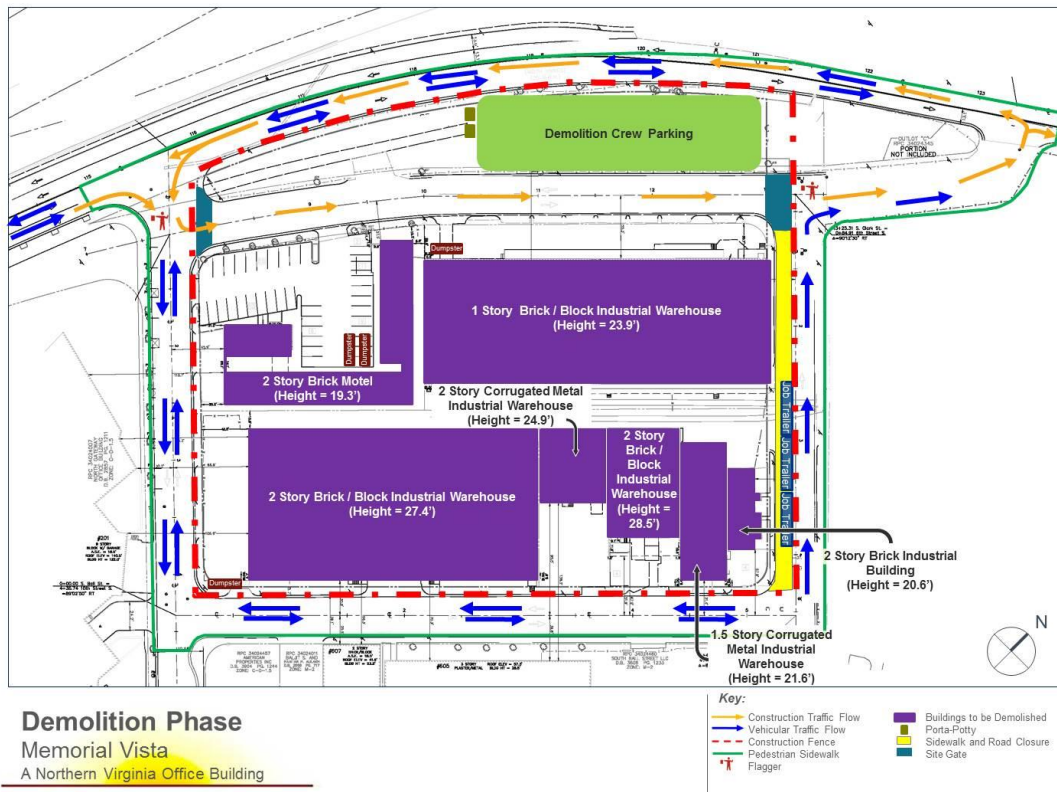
Demolition Phase Site Plan (Original Drawing Underlay Courtesy of Gensler)
